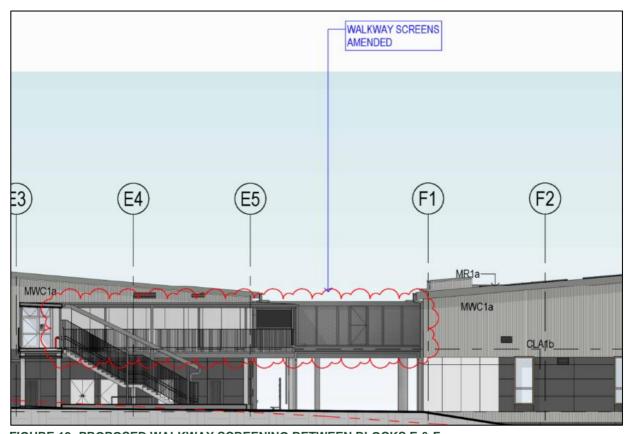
PROPOSED WALKWAY SCREENING BETWEEN BLOCKS E & F
